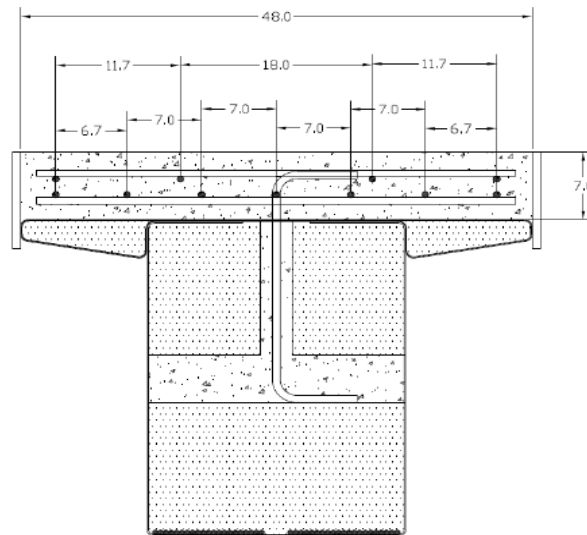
Typical cross-section of the HCB tested in AEWCLab (Snape & Lindyberg, 2009)
